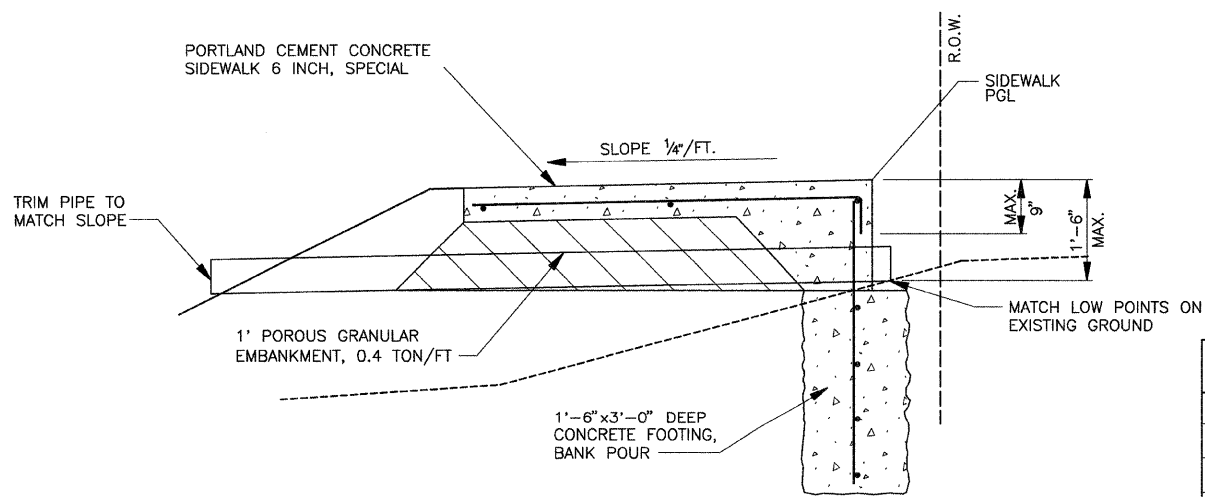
DETAIL - PCC SIDEWALK 6 INCH, SPECIAL
